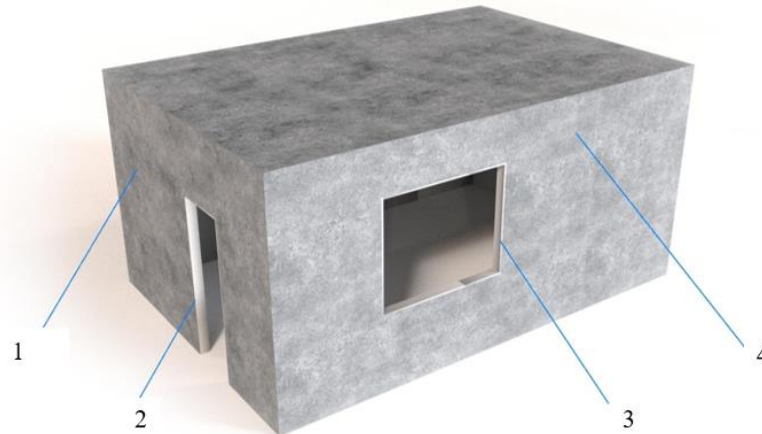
Structural solution of fibroshotcrete concrete volumetric block:
